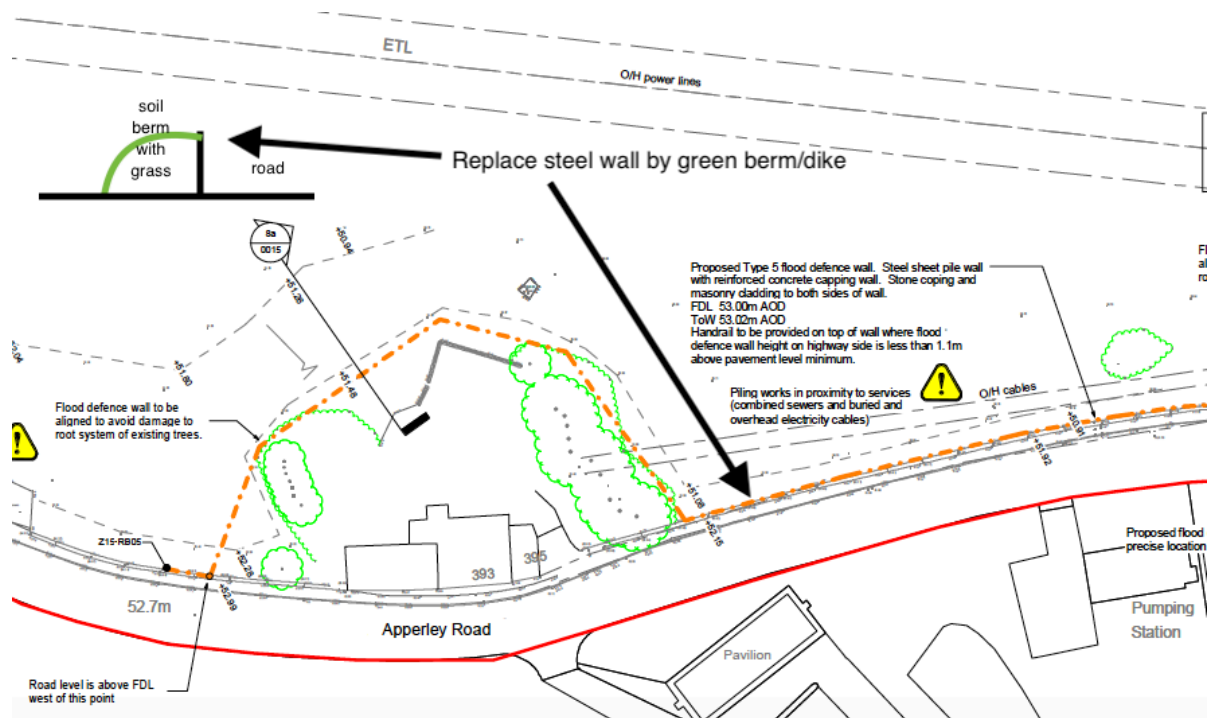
Graph relating to point a) above. Natural green berm/dike instead of industrial steel-sheet pile wall. Subsection of drawing in [1] along Apperley Road. Black arrows, larger text and cross-section of new berm against existing wall (upper-left) added by OB.
